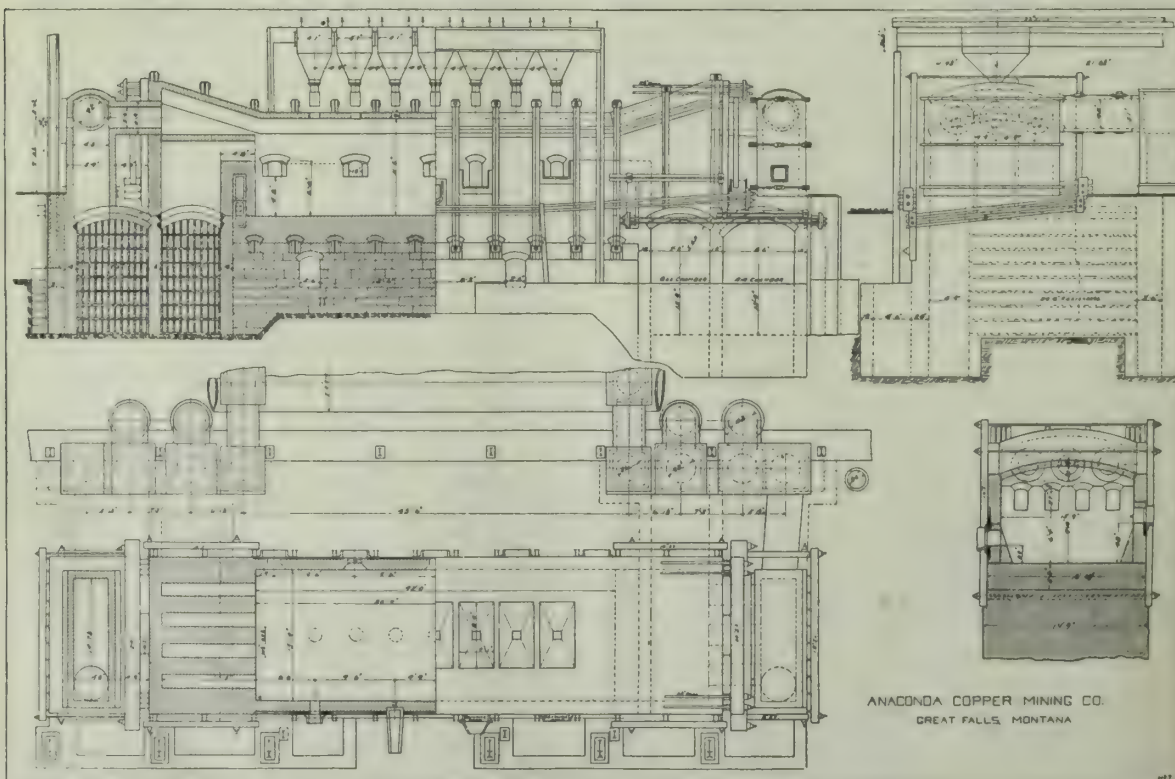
ANACONDA PLANT; PLAN, ELEVATION, AND BOILERS.
